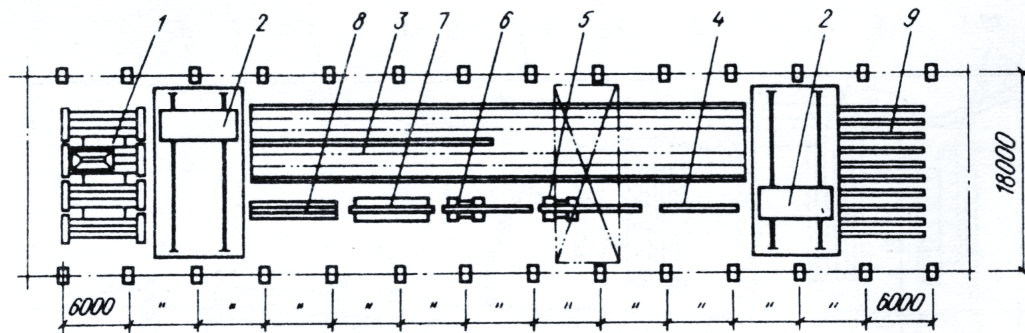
Cassette-conveyor line for making flat products of precast large-panel construction, designed by SKTB Stroyindustriya of the USSR Minsevizapstroy: 1 - forming posts; 2 - transfer carriage; 3 - tunnel chamber; 4 - stripping post; 5 - post of cleaning forms; 6 - post of lubrication; 7 - post of installation of reinforcing cages; 8 - post of preheating forms; 9 - posts of change-over.
